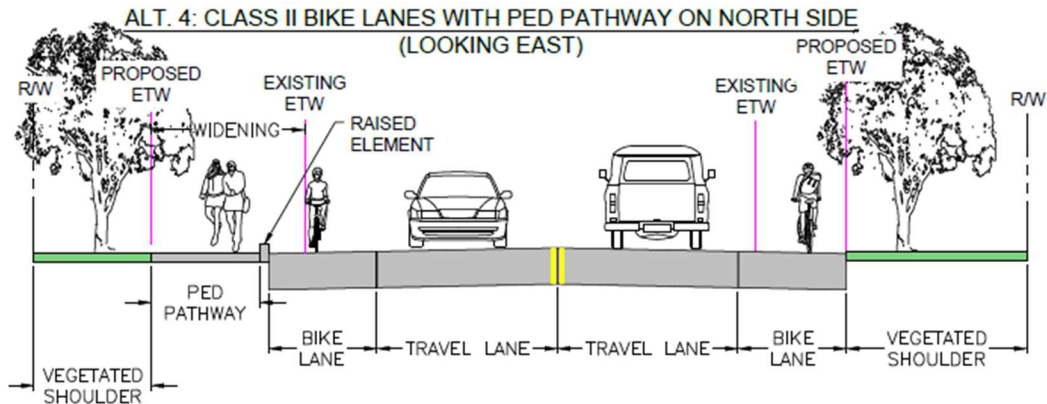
Coleman Avenue (Menlo Oaks) Alternative 4
